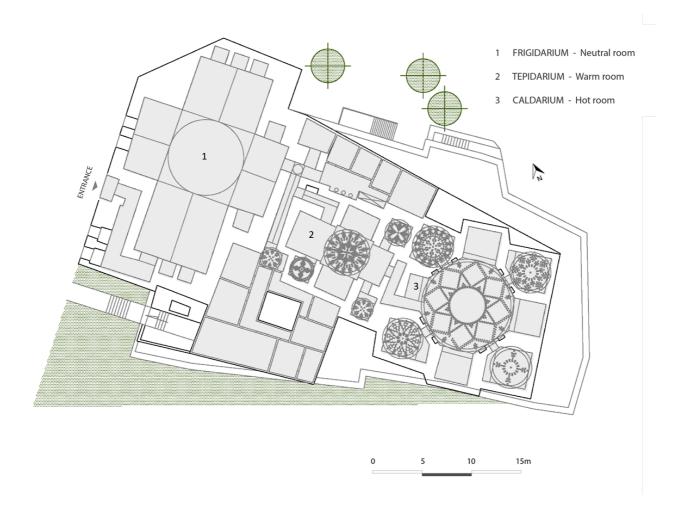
Hammam Yalbugha, Floor plan, 2020. drawn by Sally Hilal.
